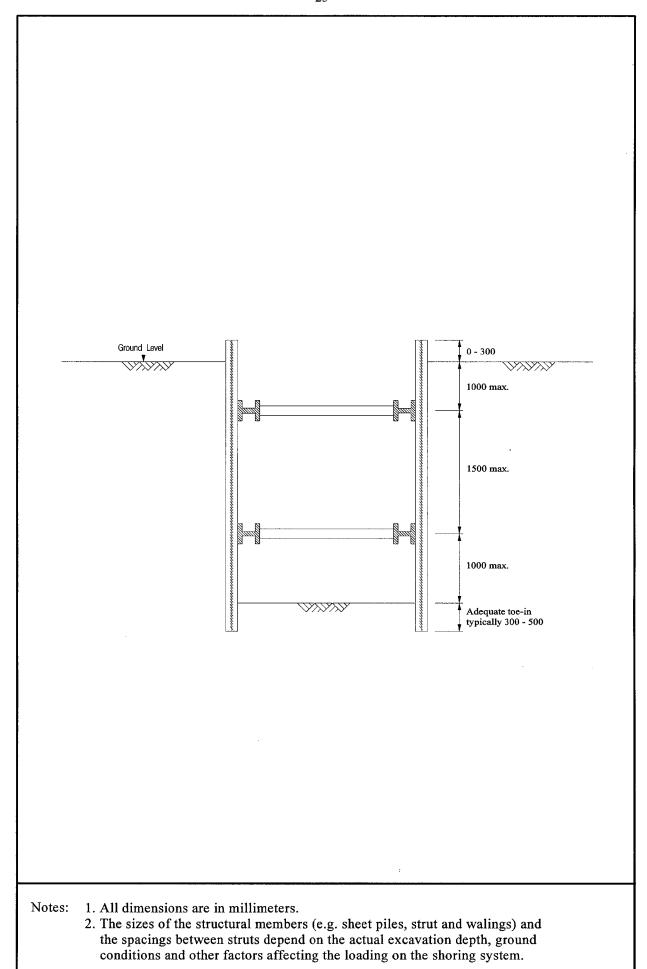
Typical sheet pile shoring detail with steel struts and walings
